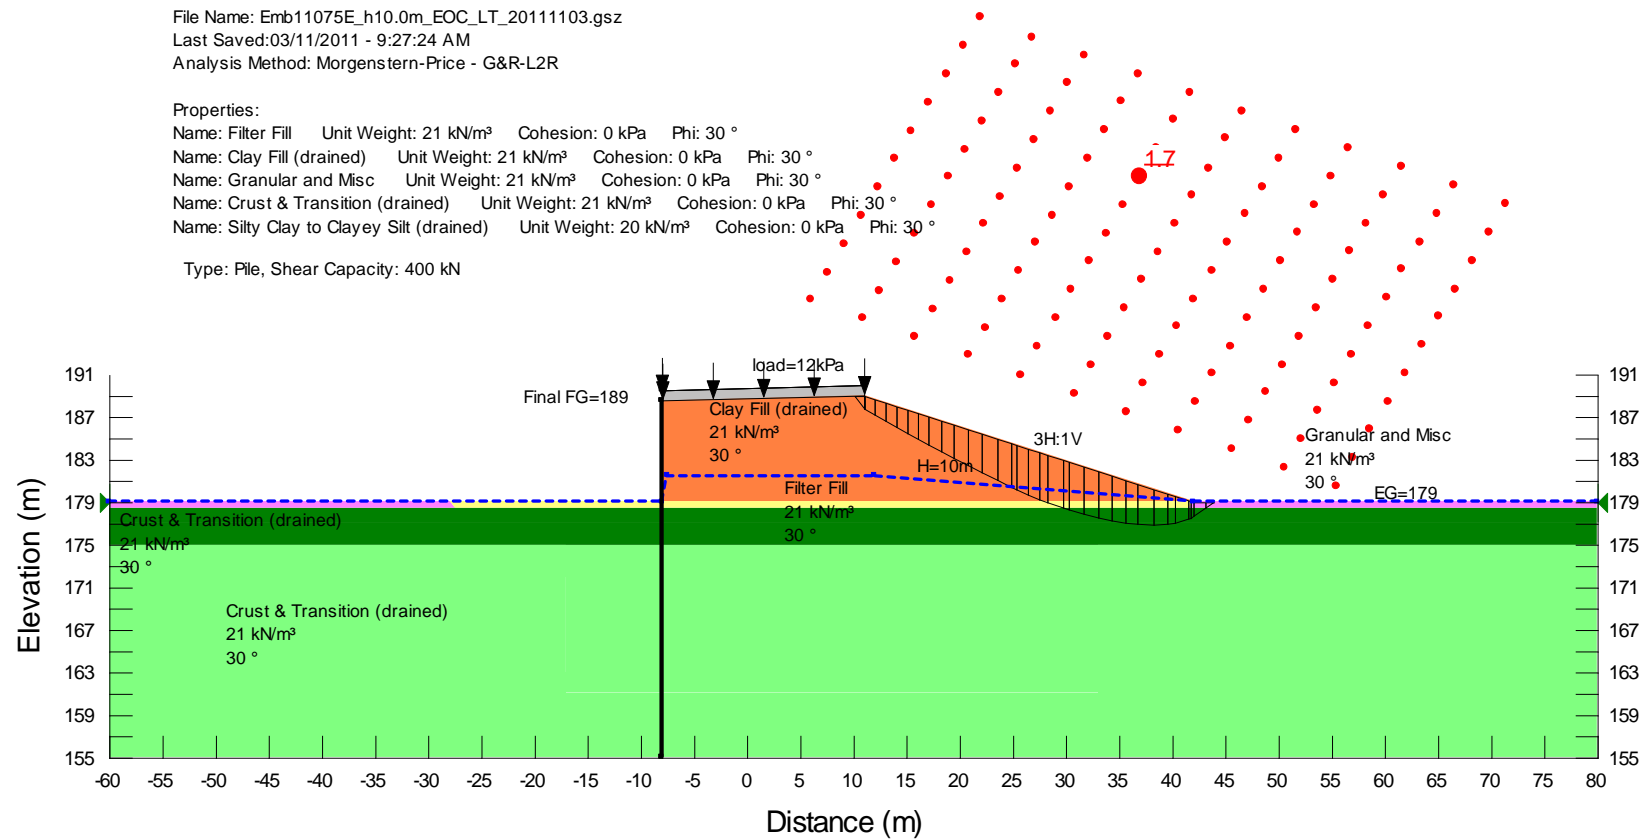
Slope Stability Result - Section 4 (Sta. 11+775W) - Stage 1 (El=189.0) - Short-term Loading
